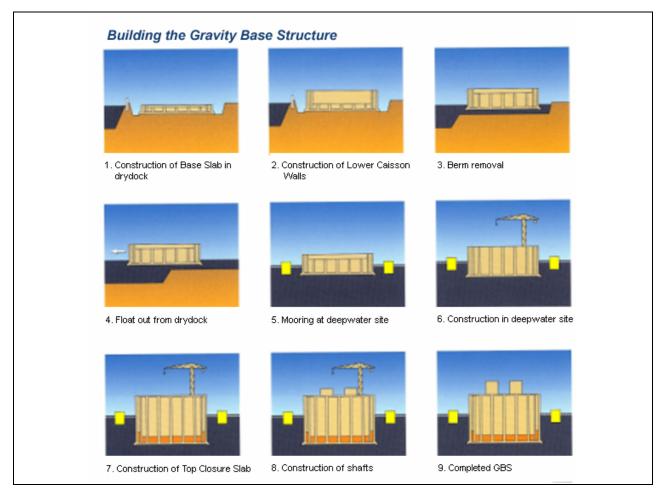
Building of the Gravity Base Structure (Example of Hibernia GBS Construction)
